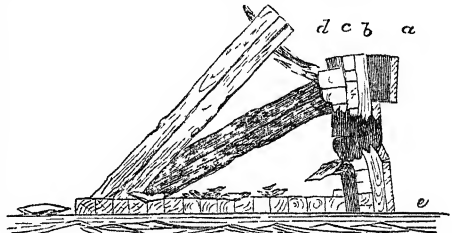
Section of do., shewing the hole made by the 600-lb. shell, and displacement of the upper plate: a, armour plating, 4½ in. thick (displaced); b, teak backing, 18 in. thick; c, boiler-plate skin, ½ in. thick; d, wrought-iron beams; e, platform.
